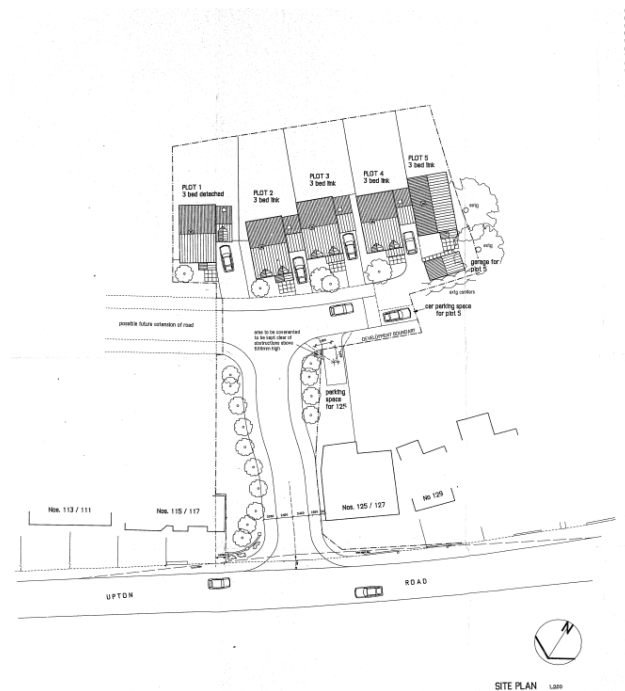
Extract of Proposed Site Plan for application P/09274/001
